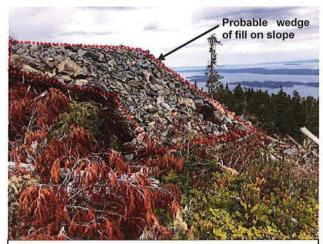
Similar location to Photo 3 (northwestern area of site) showing fill over crest of bedrock slope.
